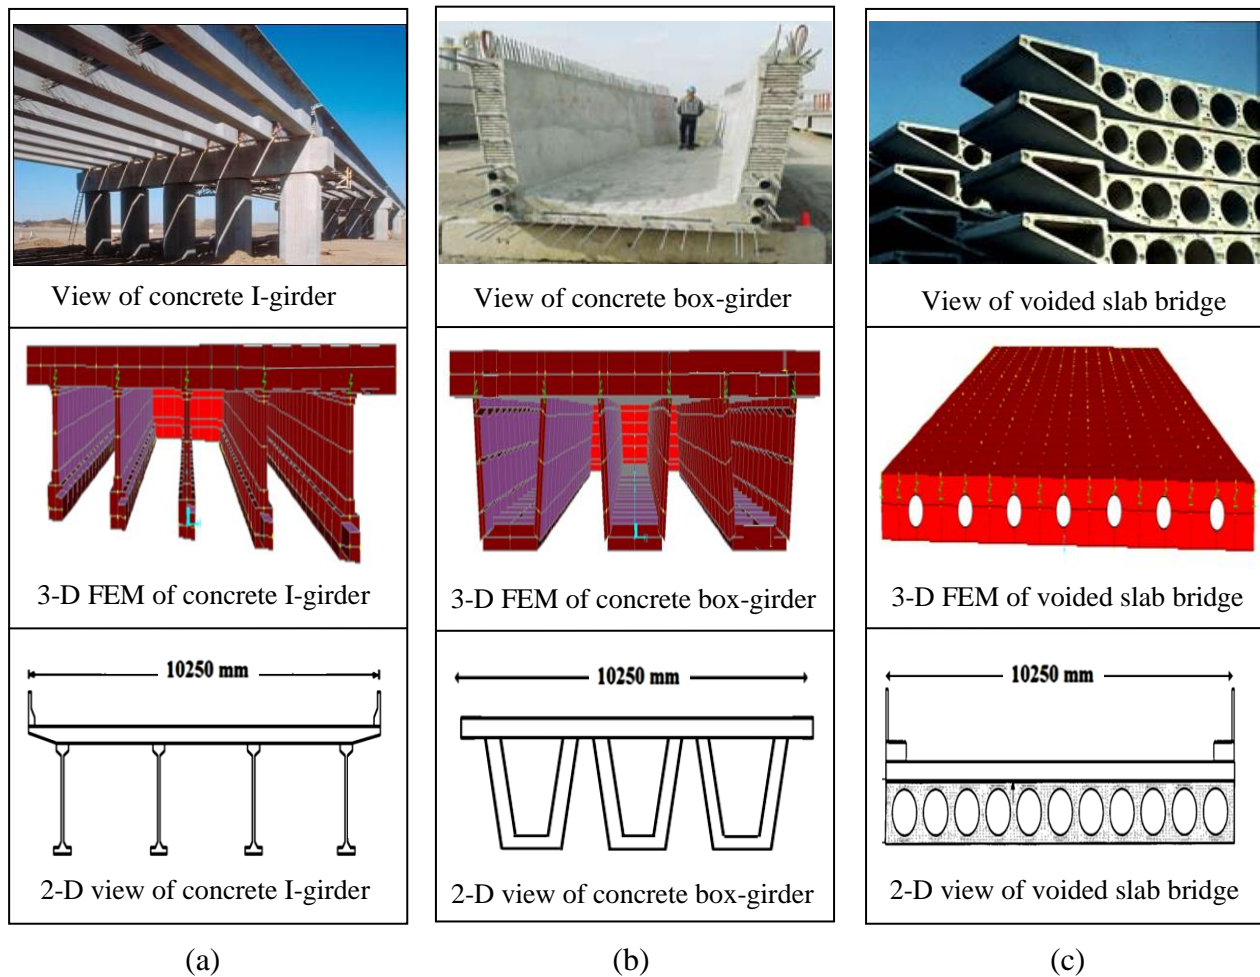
View of (a) Concrete I-girder, (b) Concrete box-girder, (c) Voided slab bridge.
